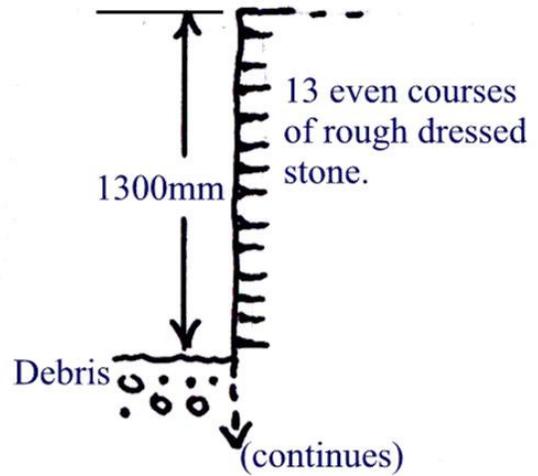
Dam Banks East Sluice, side elevation of the sluice gate (north side)
